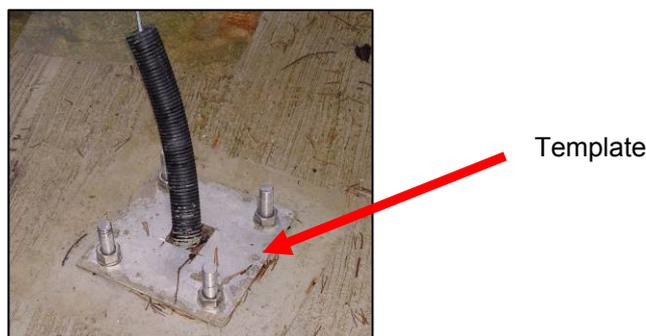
Installed Anchor Frame BEFORE removal of template and reinstatement of the site
